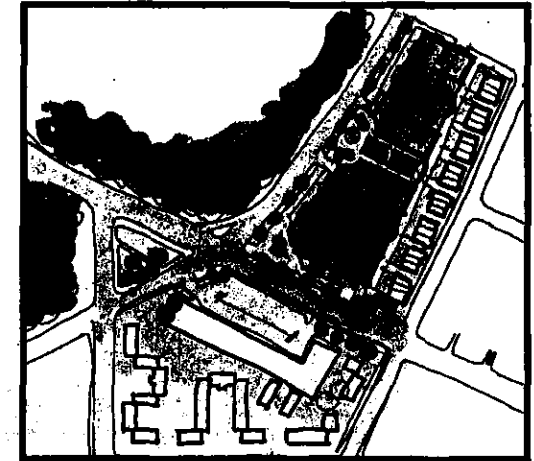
Plan, Fort Davis Shopping Center (background)
